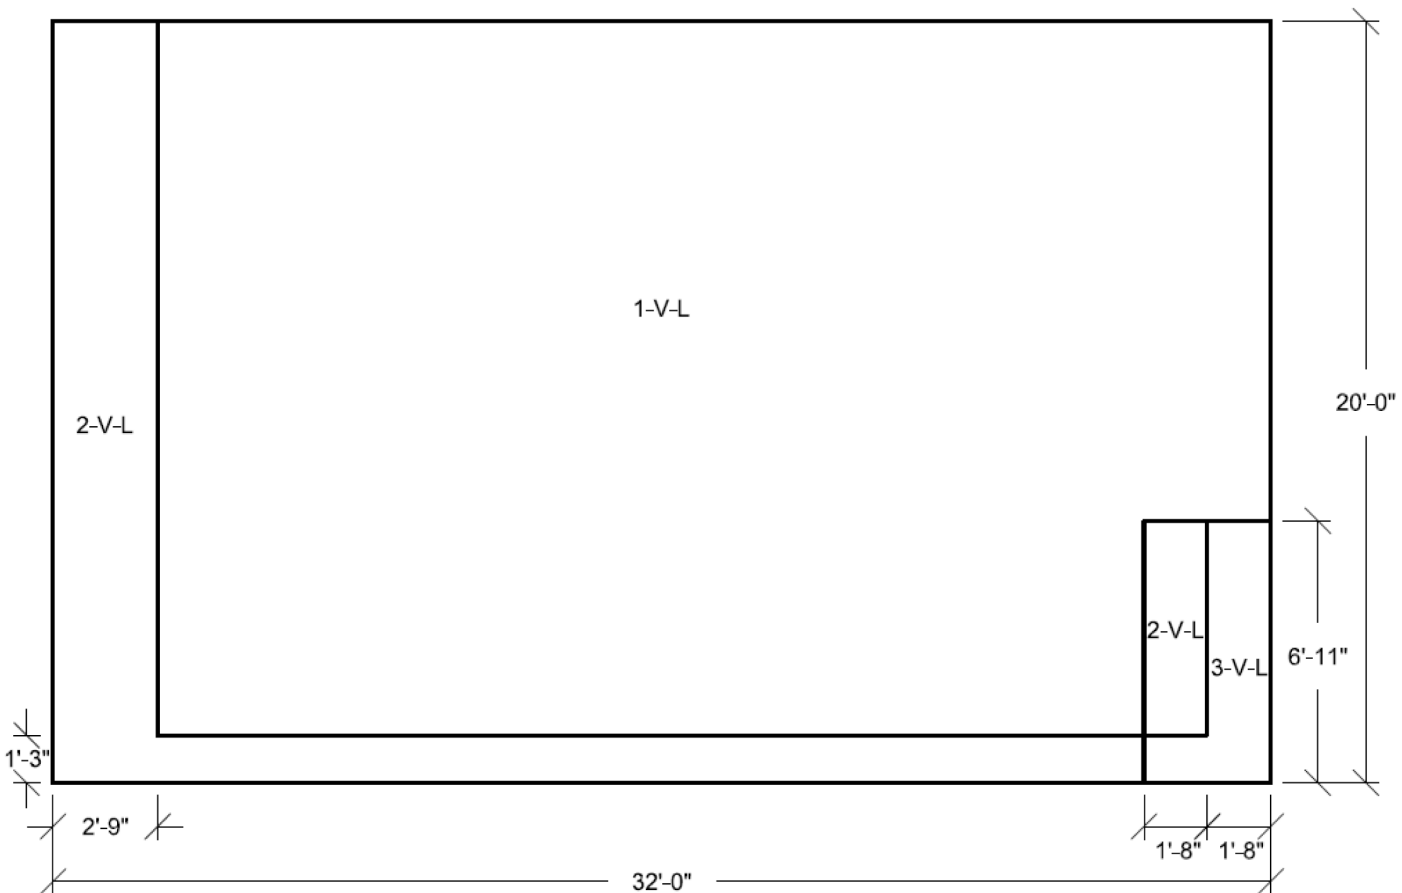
H.6-197 DGFOV Wall 14 Looking From Outside
